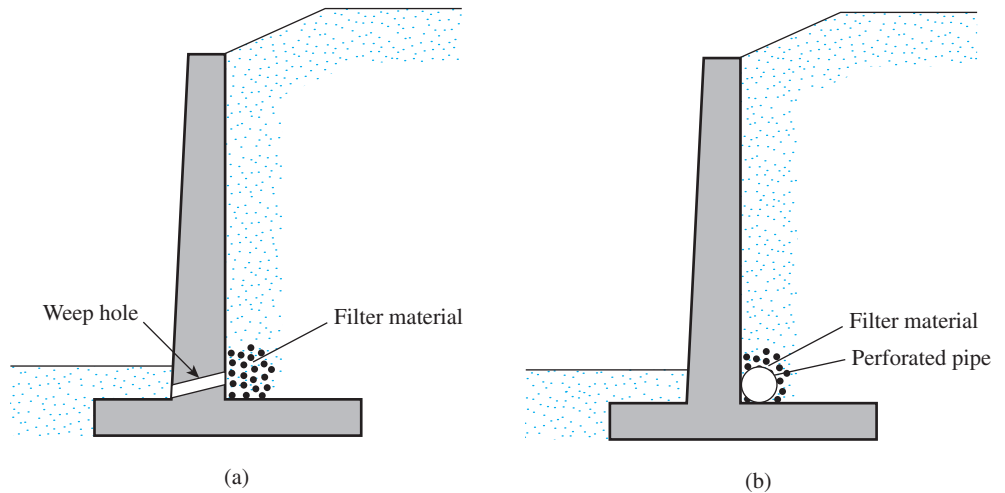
Drainage provisions for the backfill of a retaining wall: (a) by weep holes; (b) by a perforated drainage pipe
